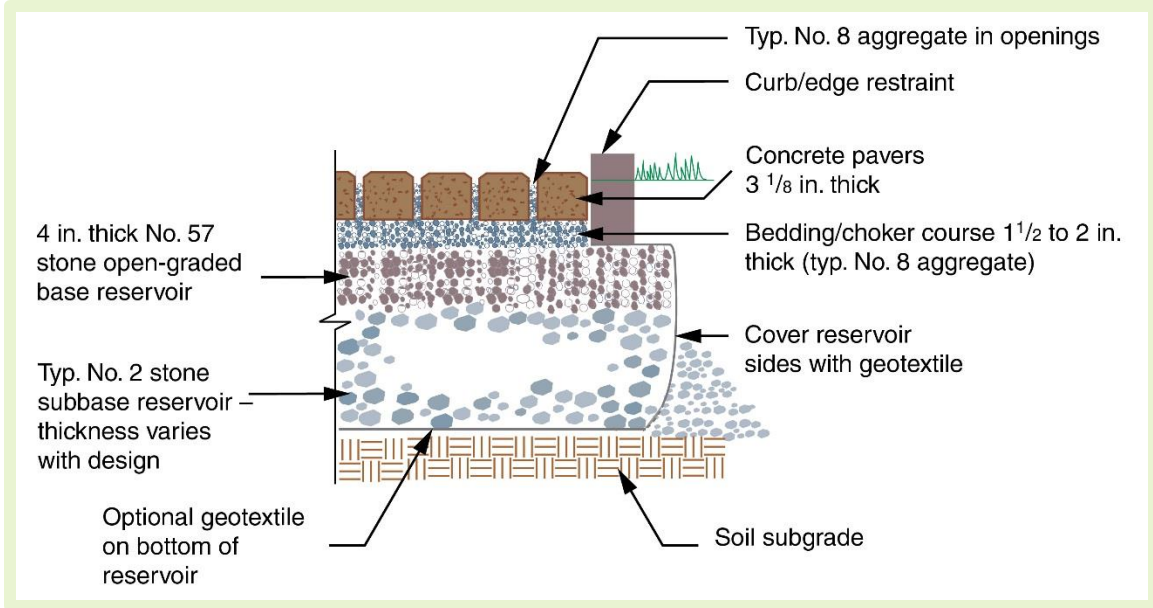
Typical Permeable Paver Section (Credit: ICPI)
